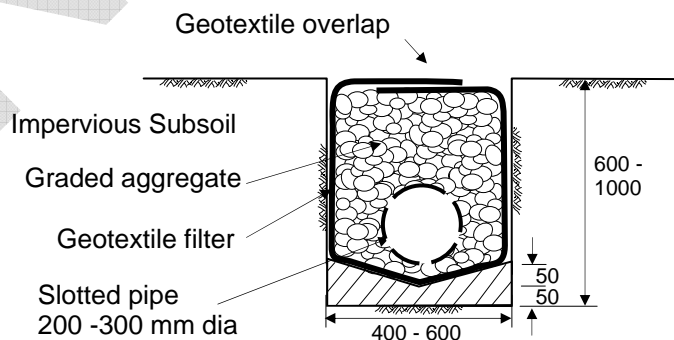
(b) - Cross-section of a typical subsoil drain used in pervious soil
